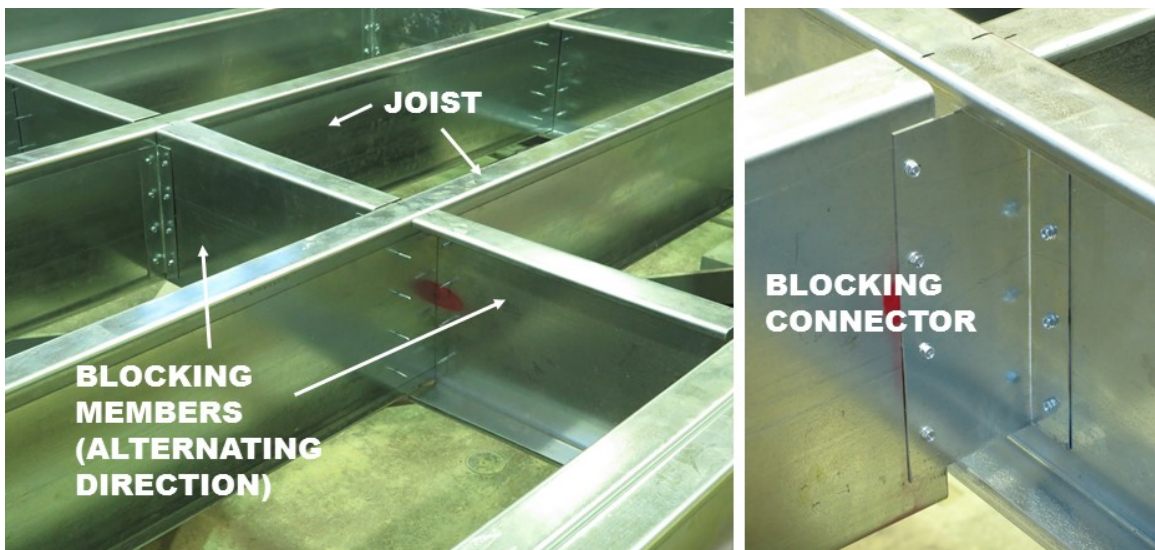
(Left) Alternating Blocking Members (Right) Blocking Connected to Joist (Open Face)
